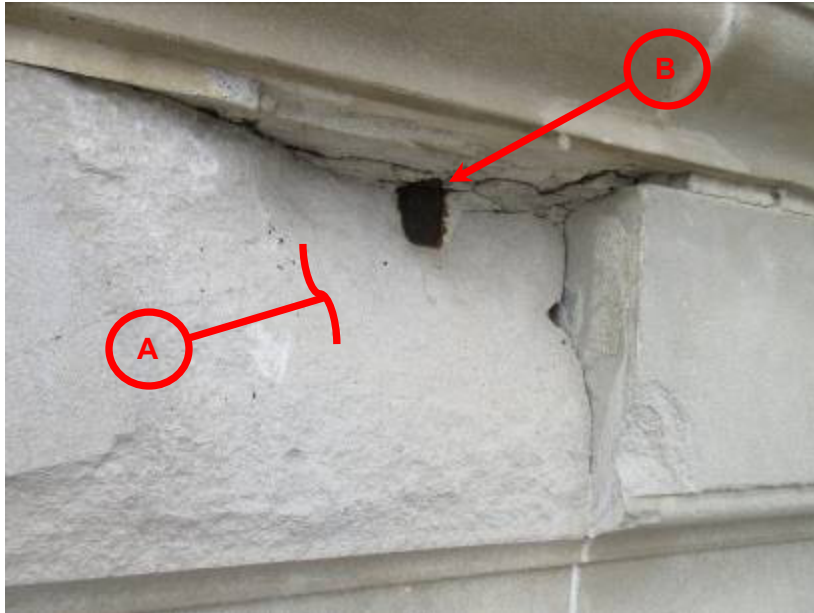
(A) Large spalled section of stone caused by corrosion of embedded cramp anchor (B) (lateral tie for the stone) at 6th floor on Drop no. 16.
